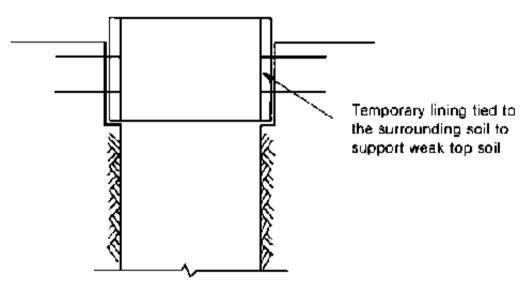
Excavation for a pit to be lined with precast concrete rings
